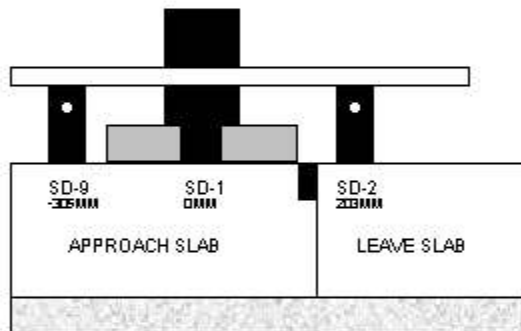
APPROACH SLAB LOAD TRANSFER
